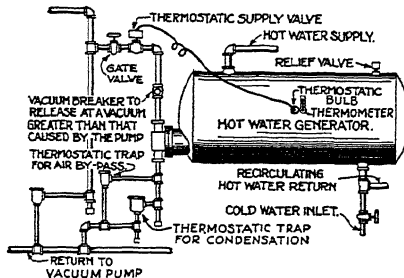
SELF-CONTAINED THERMOSTAT ON HOT WATER TANK WITH VACUUM RETURN
